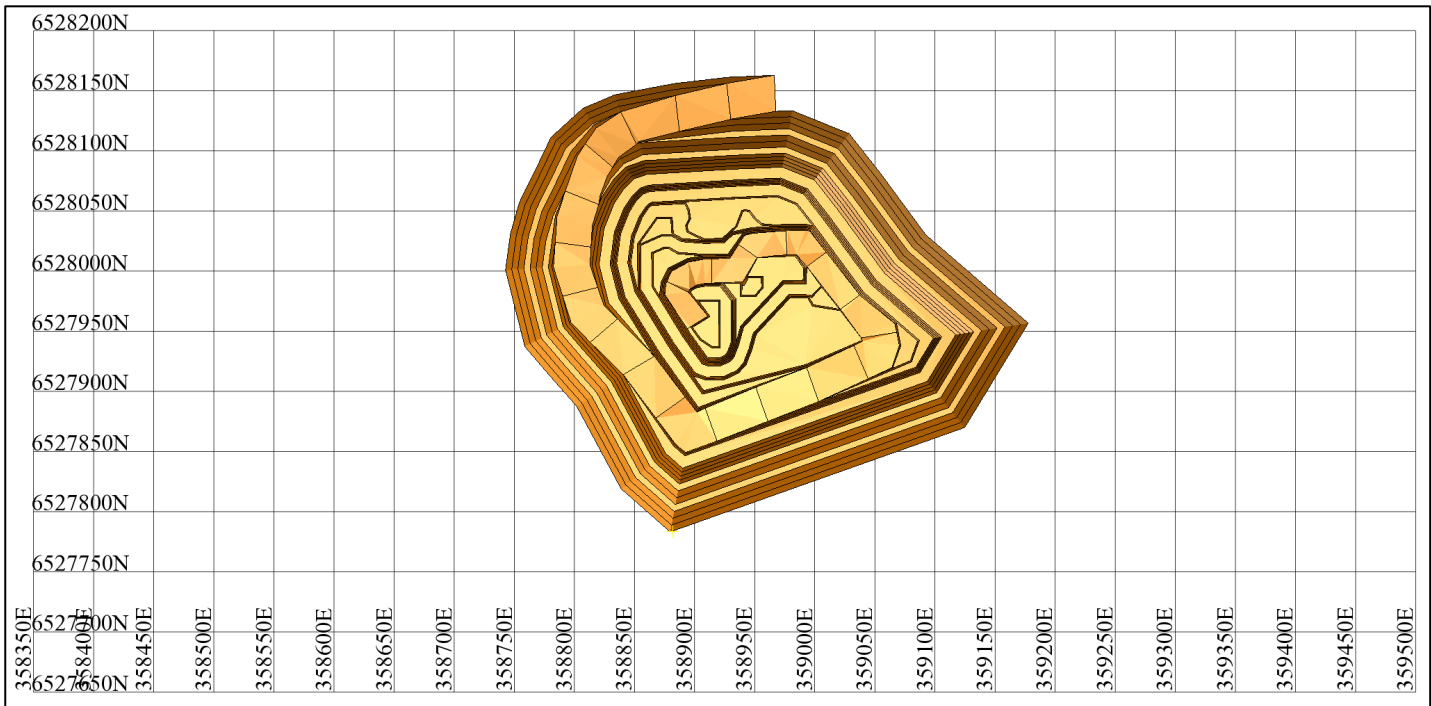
Theia stage 2 pit design – Plan view – Production Case
